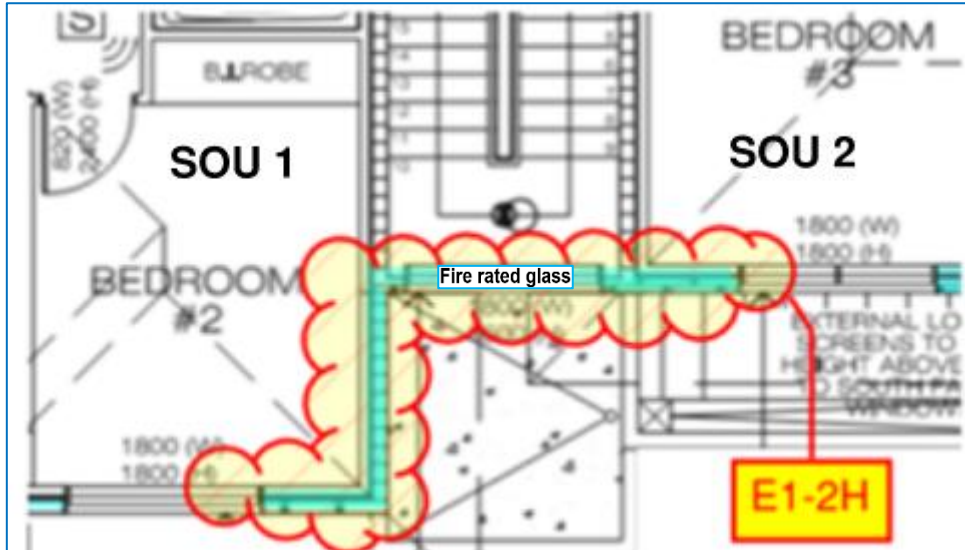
The external wall has cladding that connects two individual SOUs that are located either side of a fire isolated stair (assuming fire rated glass)
